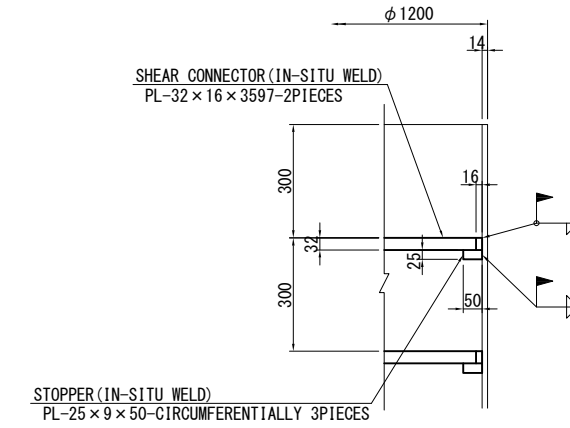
DETAIL OF ATTACHMENT OF SHEAR CONNECTOR
